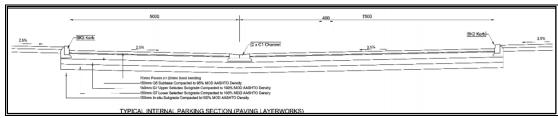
Proposed Road Layerworks: Brick Paving- 540 mm total thickness (source: Walters, 2020)
